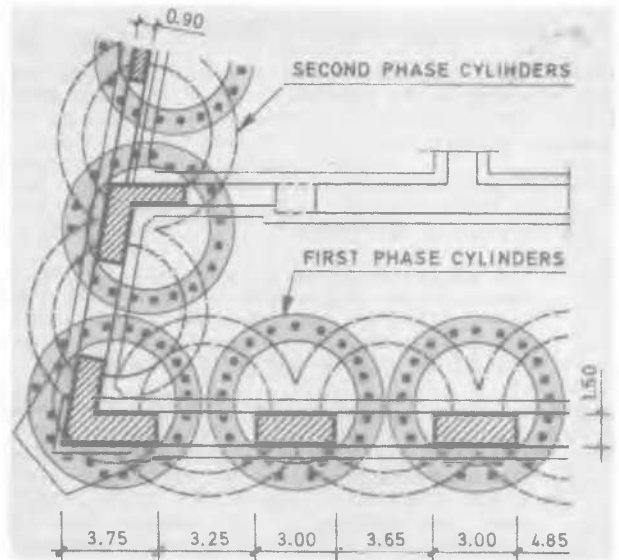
Plant of frozen soil cylinders and pier foundation panels.
